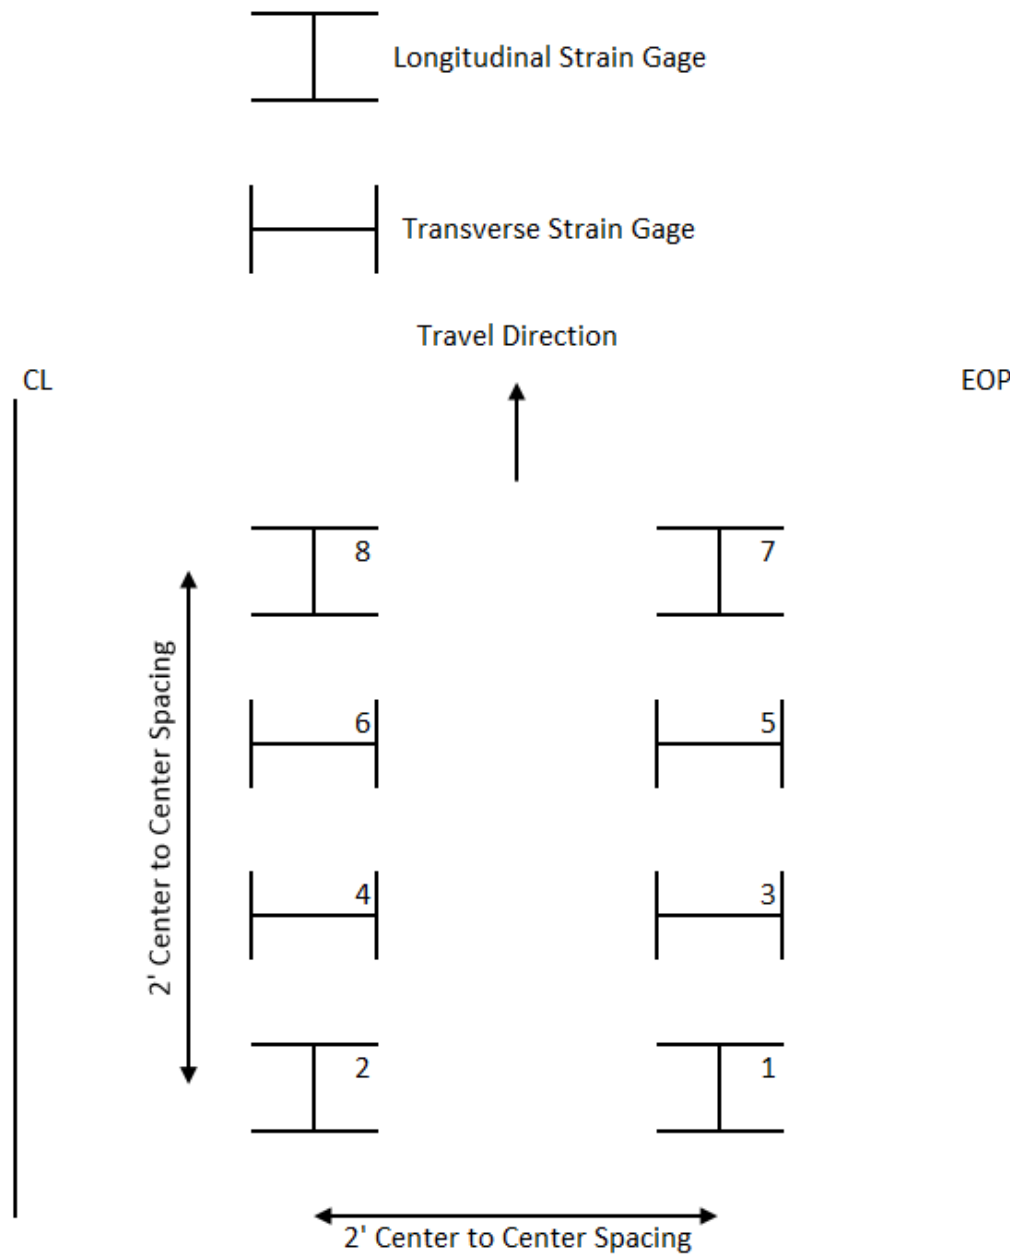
Strain Gage Layout for Sections Other than Sand Blanket
